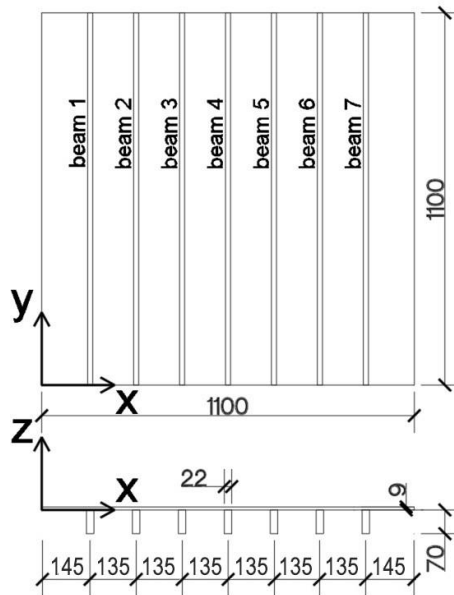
Top and front view of the scaled joist floor. The dimensions are in [mm].
